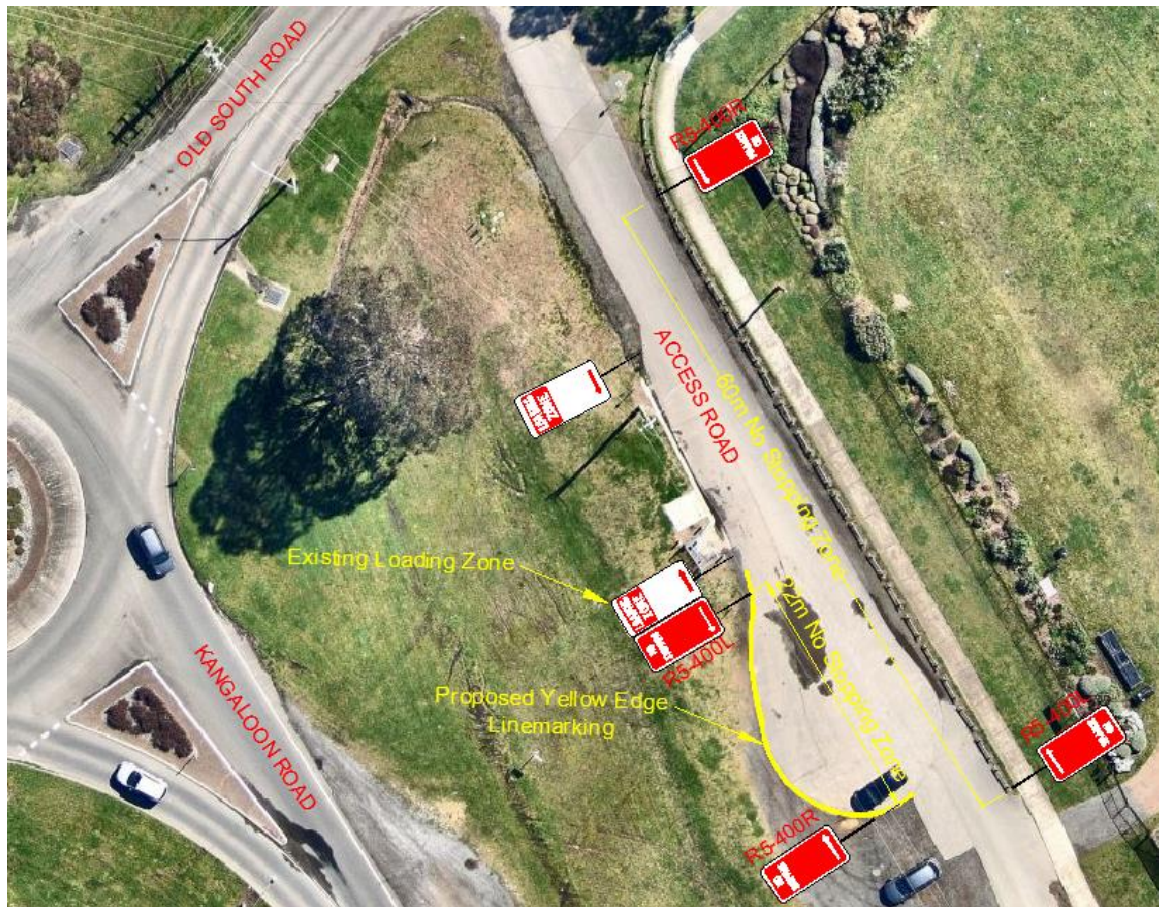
Proposed No Stopping Zone on Bowral Water Filling Station Access Road
